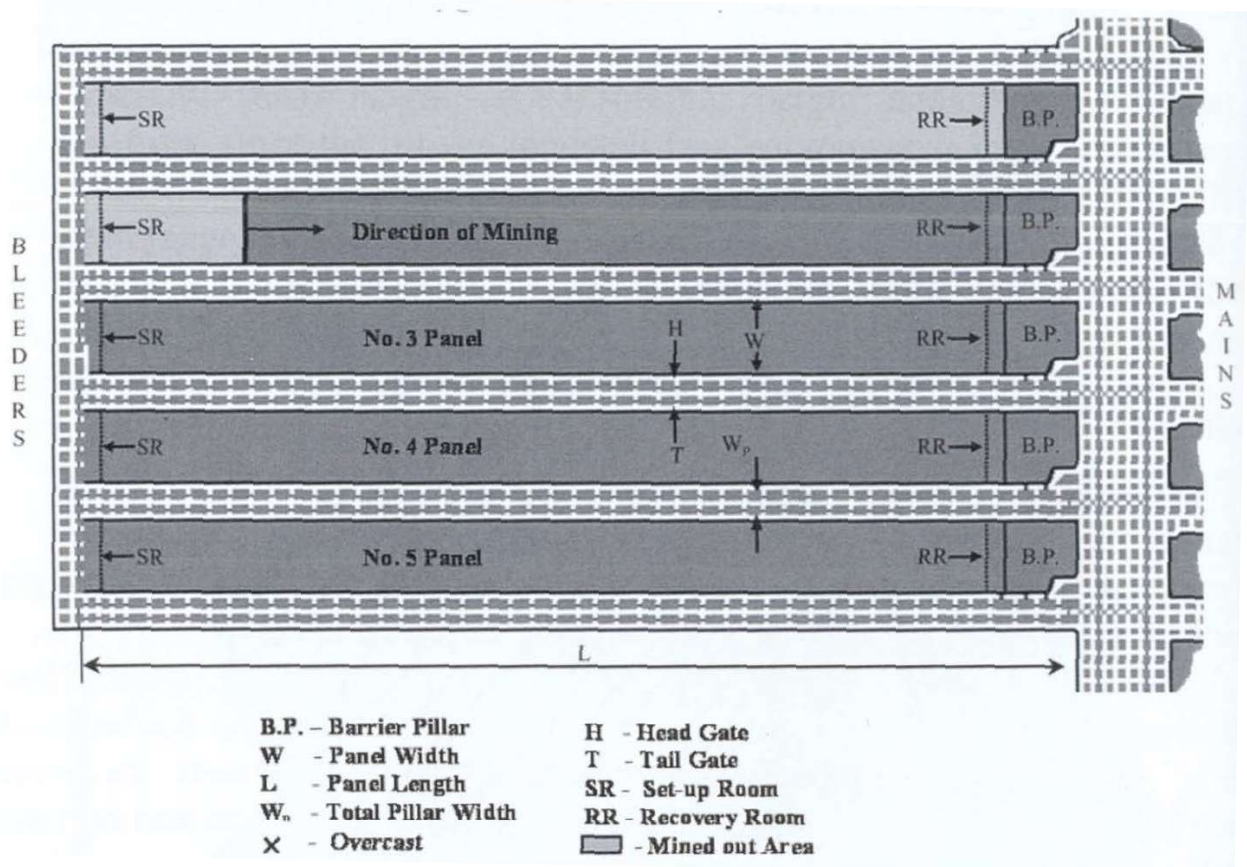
Typical US Longwall Panel Layout (Peng 2006)
